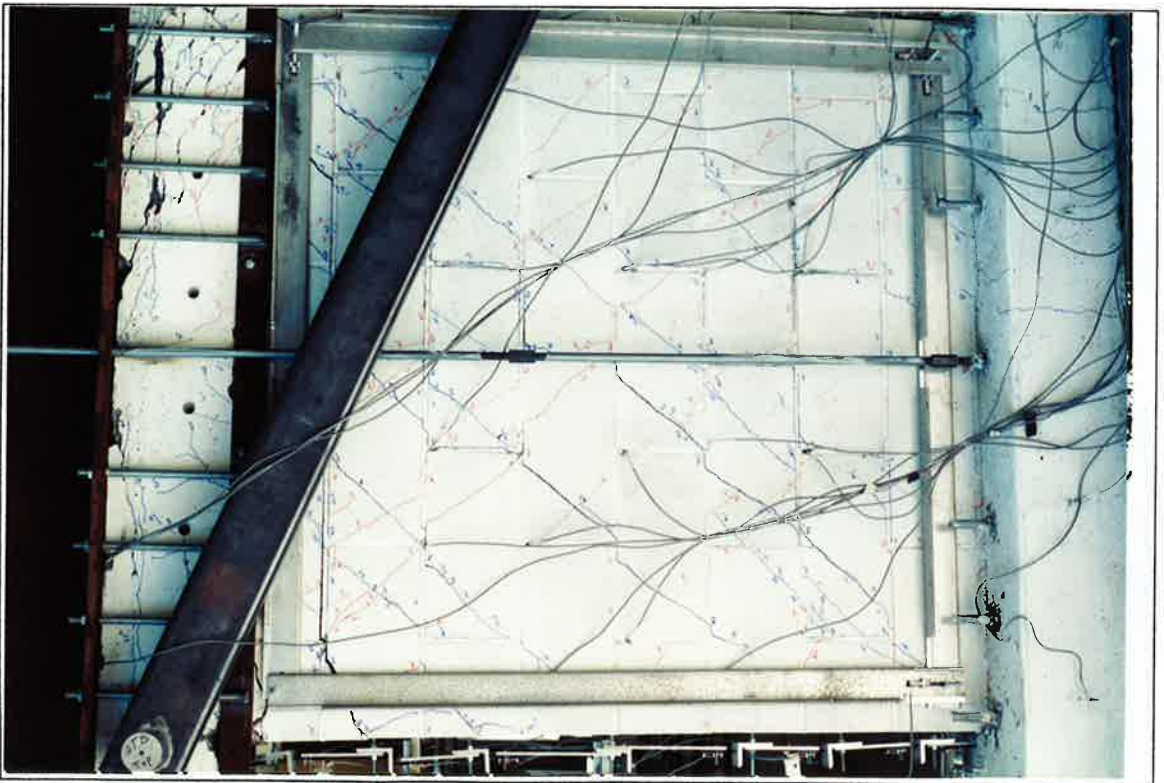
Monolithic Wall South Face With Retrofitted Cap Beam
